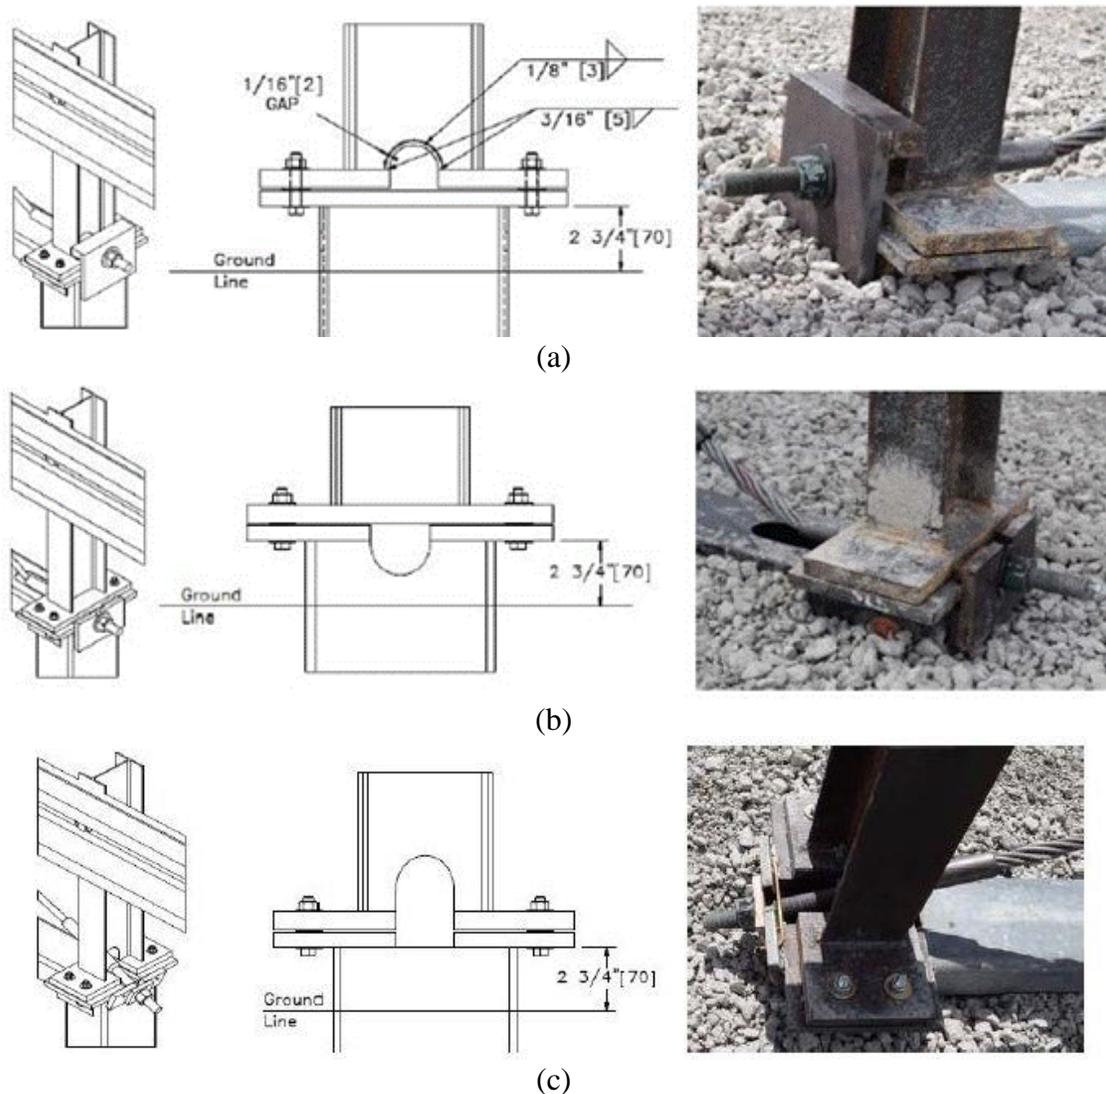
Candidate Design Concepts: (a) Concept Nos. 1&4 – Cable Through Upper Post, (b) Concept No. 2 – Cable Through Foundation Tube, and (c) Concept Nos. 3&5 – Anchor Cable Through Foundation Tube with Angled Bearing Plate
